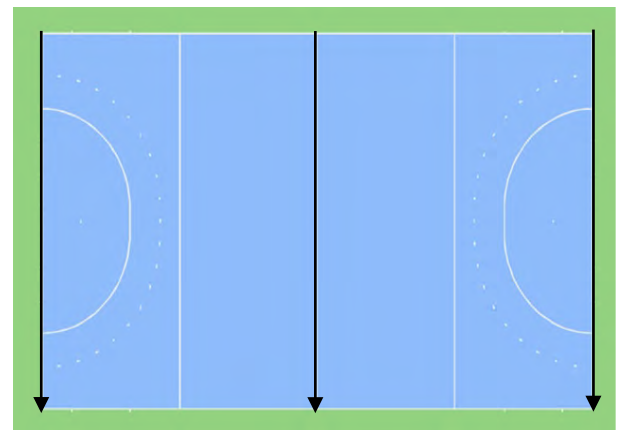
single plane with cross field slope, most commonly used with vertically draining constructions
